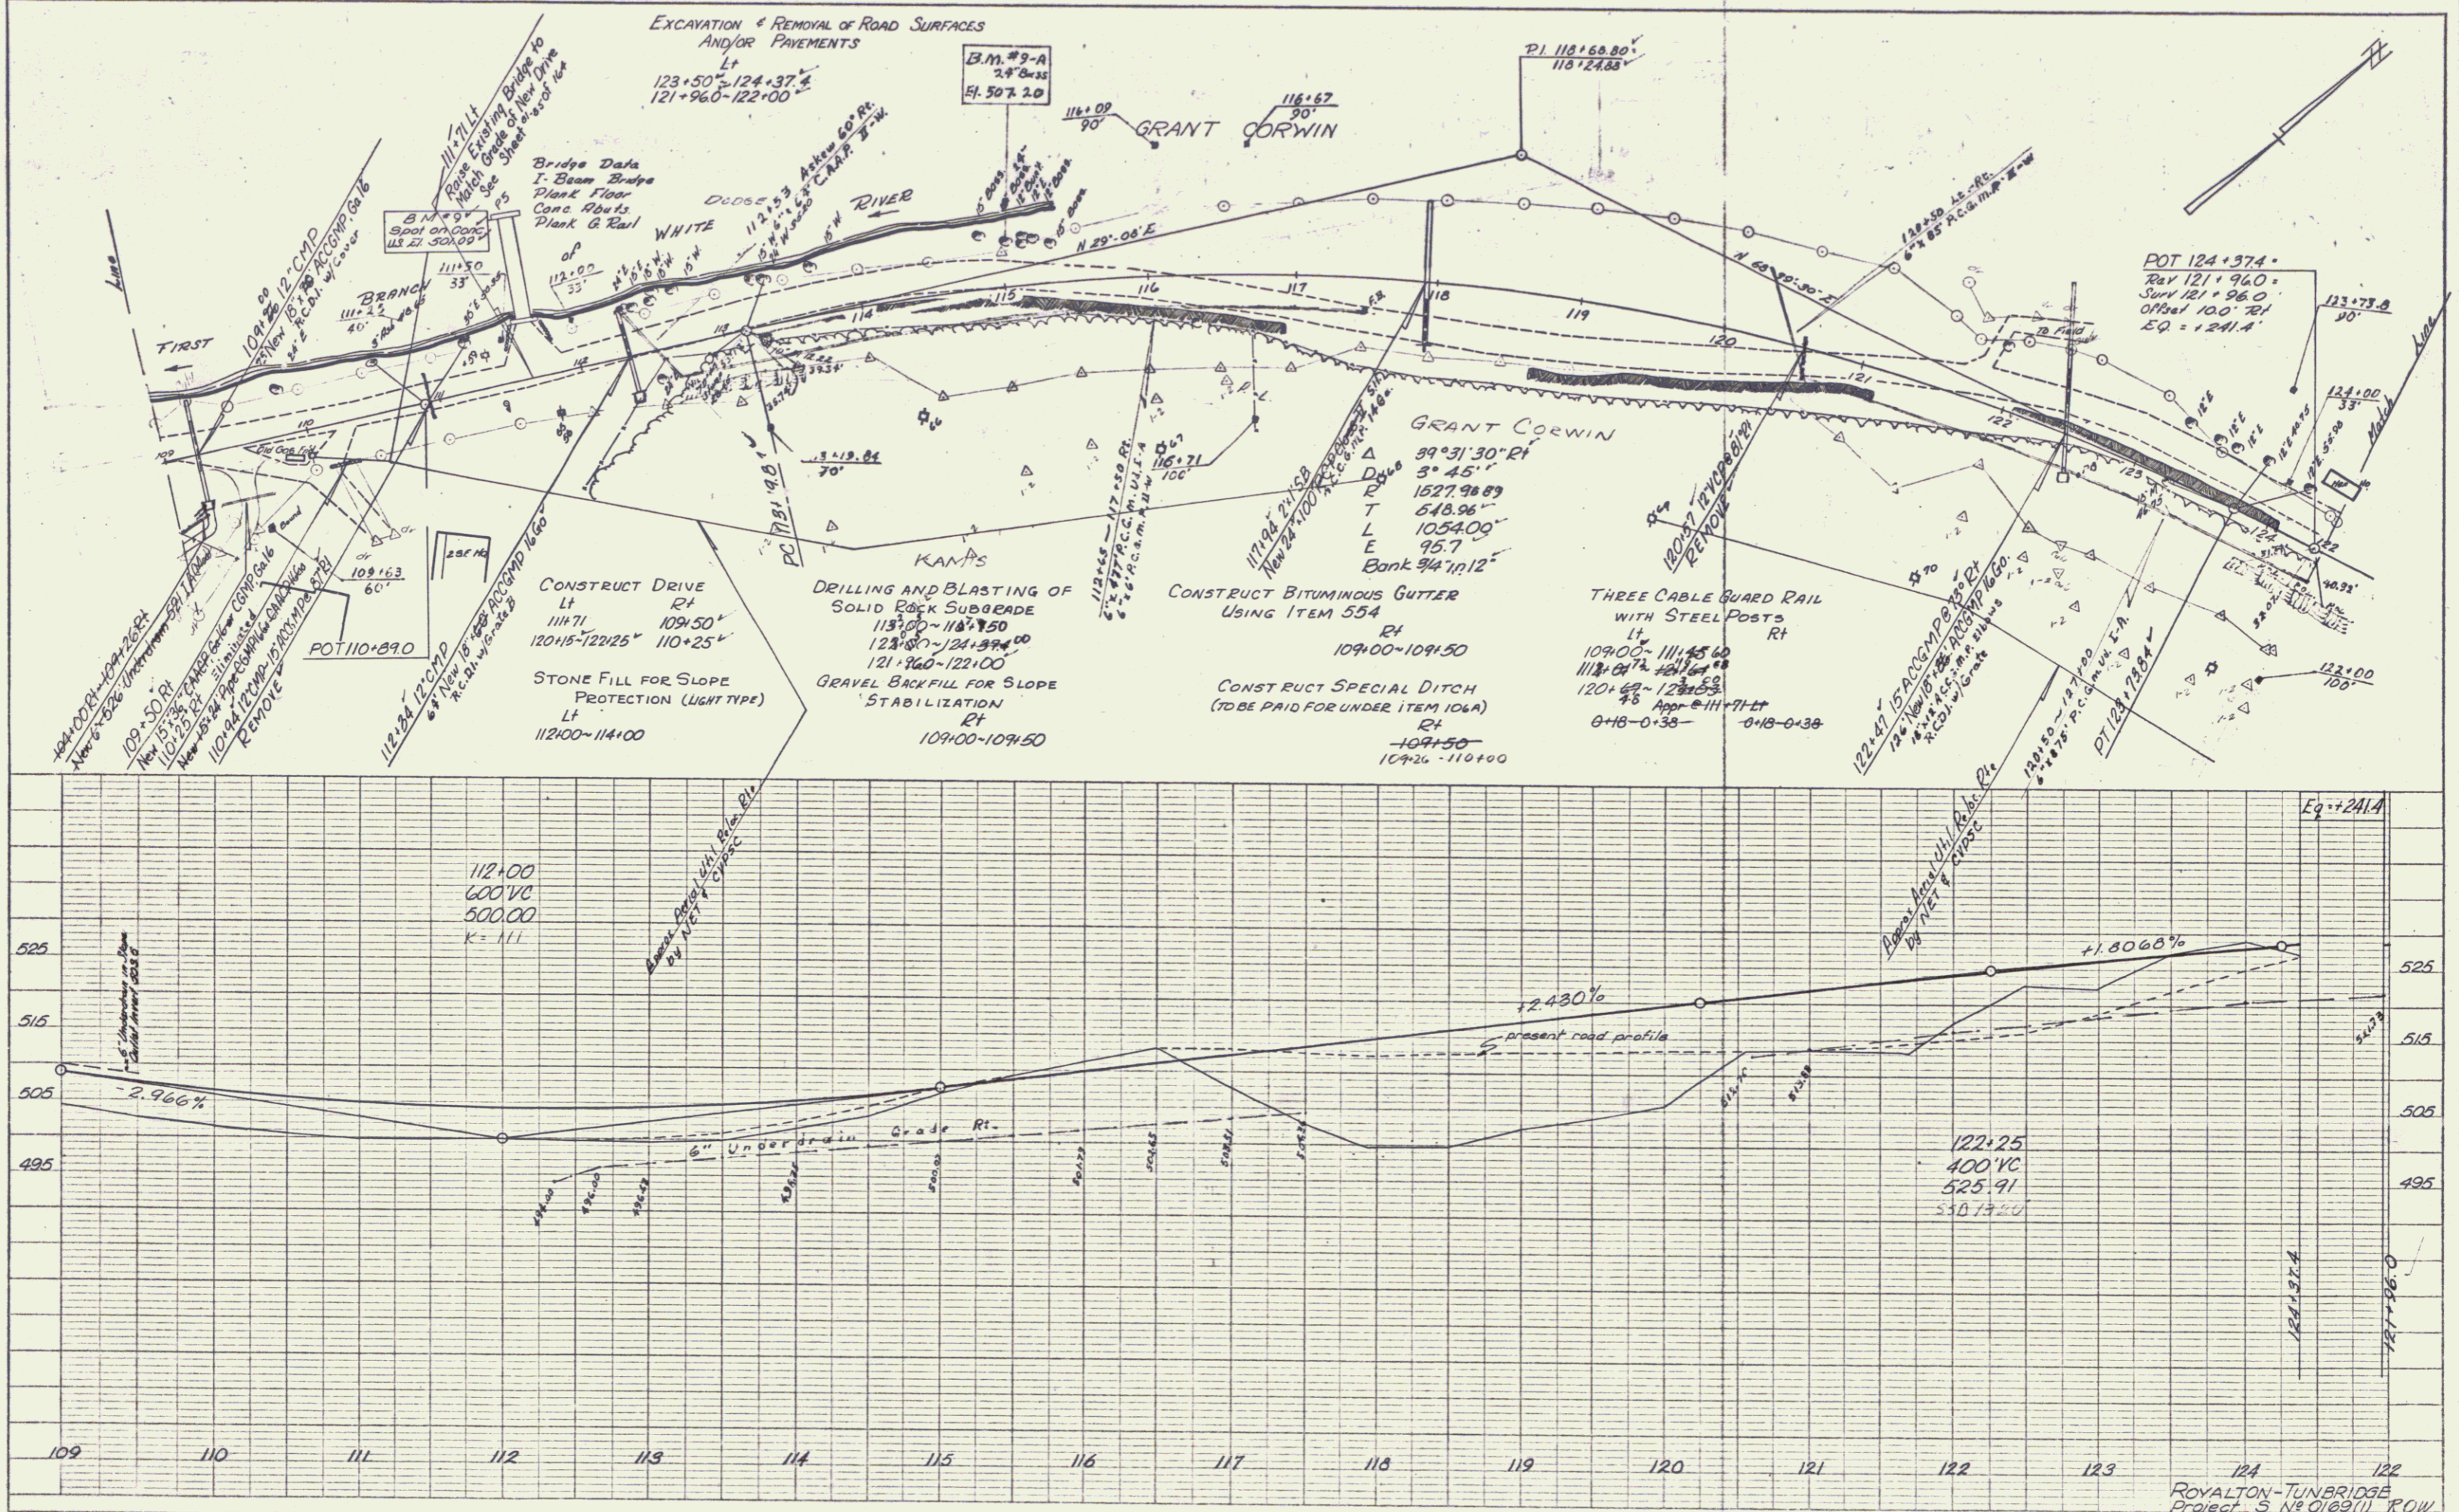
PLAN, PROFILE & P.A.S.E. STANDARD
